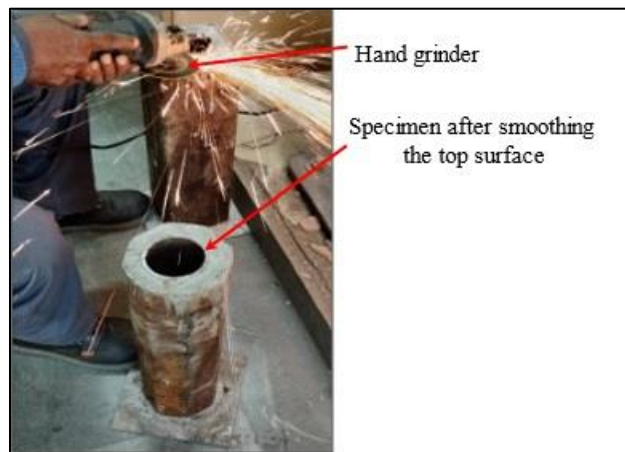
Surfaces smoothing and flattening using a hand grinder
